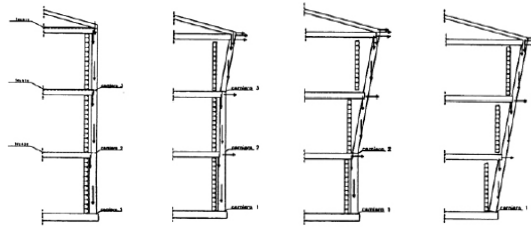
Sequence of the out-of-plane failure of the façade wall (Cardoso, 2002).
